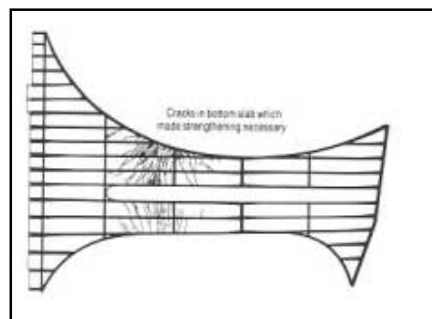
Plan view of Ruhr Bridge (showing cracks)
